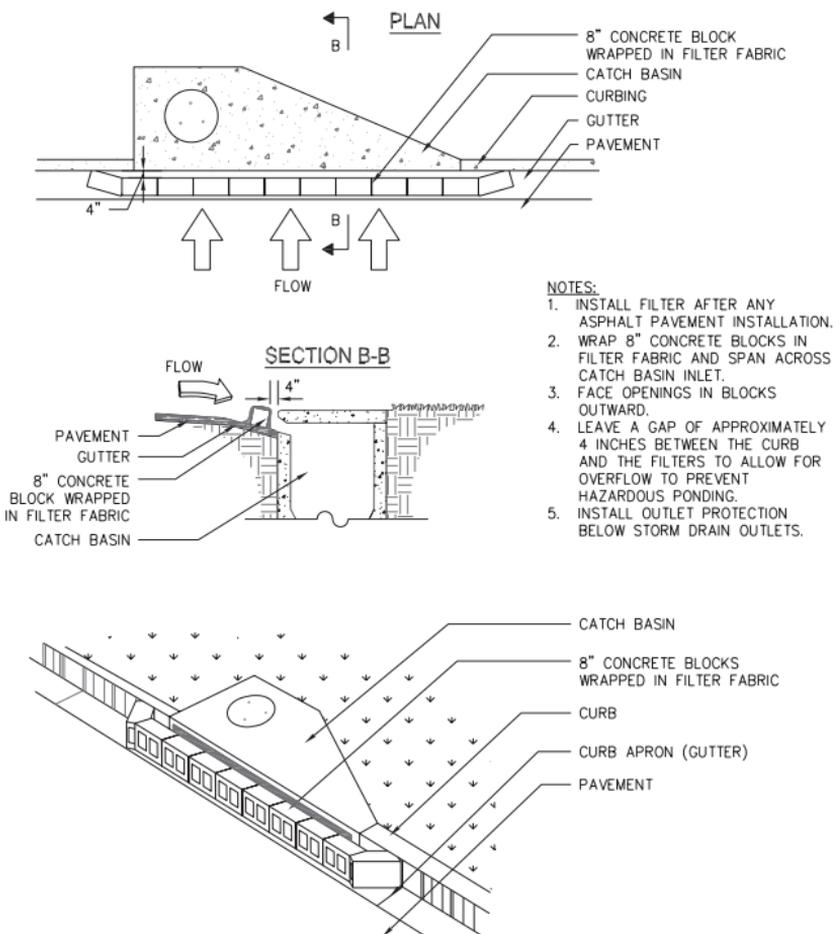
Curb Inlet Protection Installation Requirements (Sd2-P)
